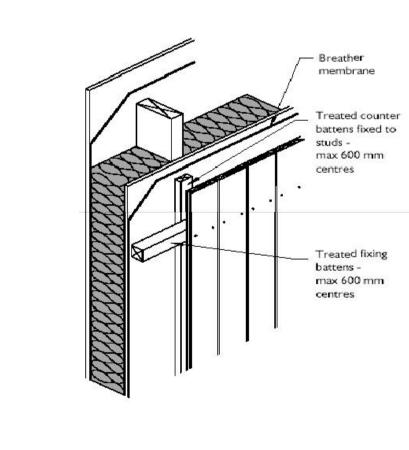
Typical construction: vertical tongued and grooved boarding on horizontal battens and counterbattens.
